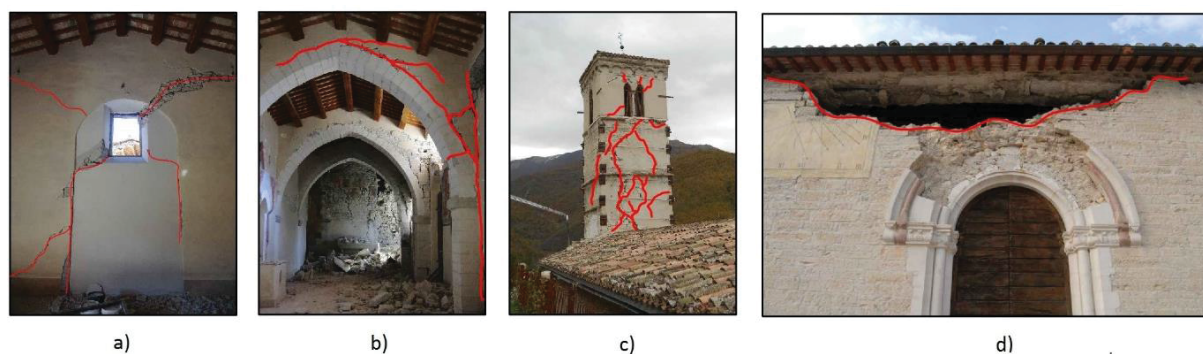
Damages observed on the north-west facade (a), central arch (b), bell tower (c) and on the south-west facade.
